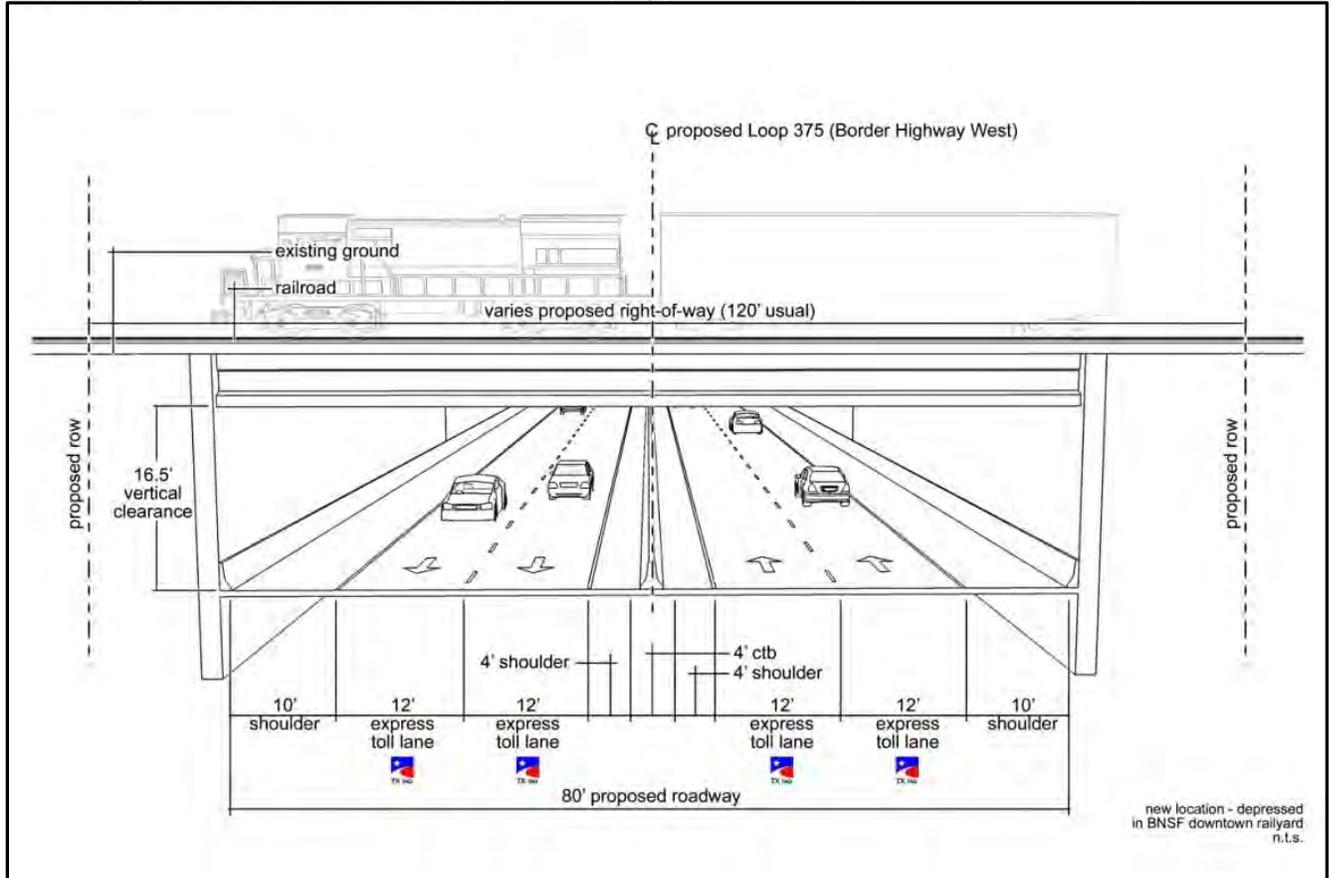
Border B Typical Section (Alternatives 1 and 4)
